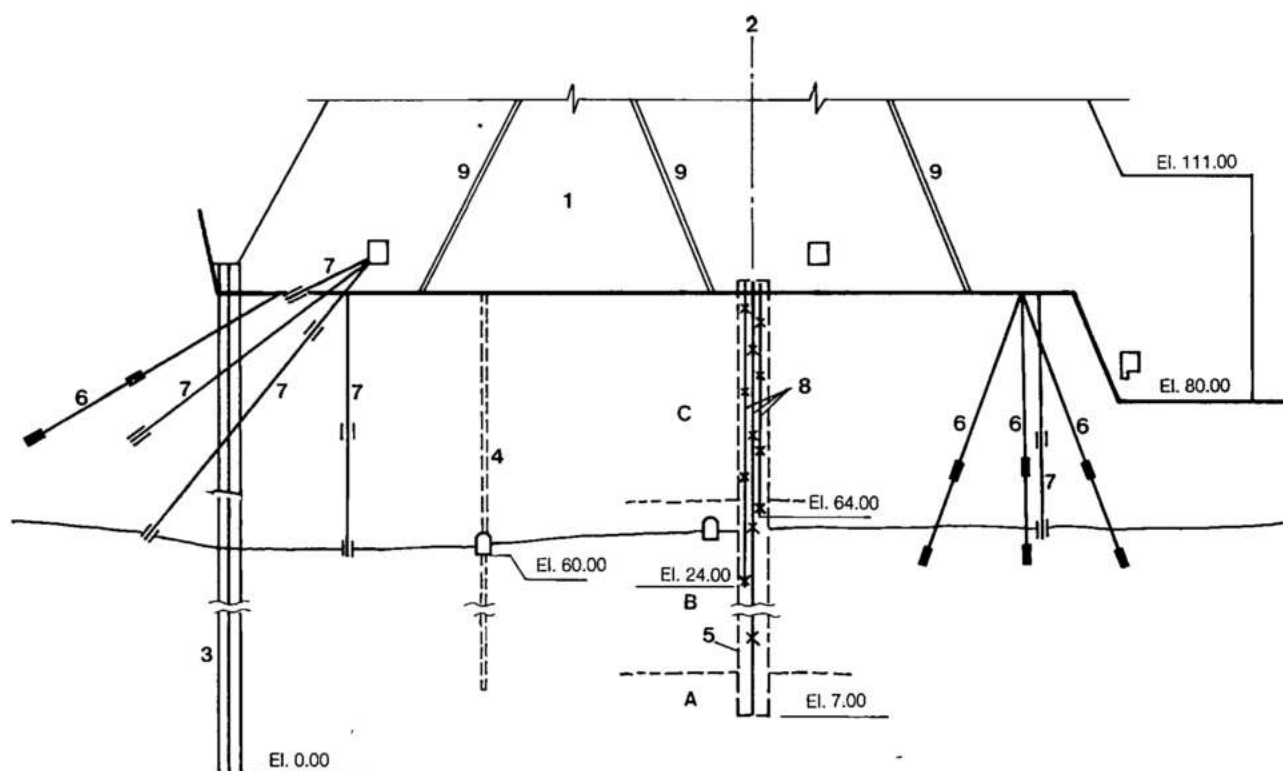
Instrumentation of foundation in a typical hollow gravity block
